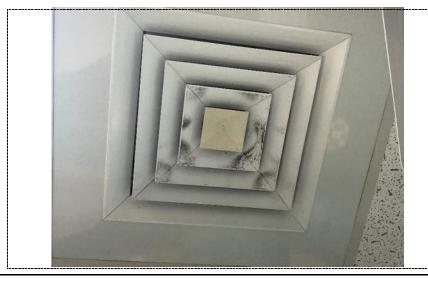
Impacted diffusers throughout North and South classroomsbuilding 2.
